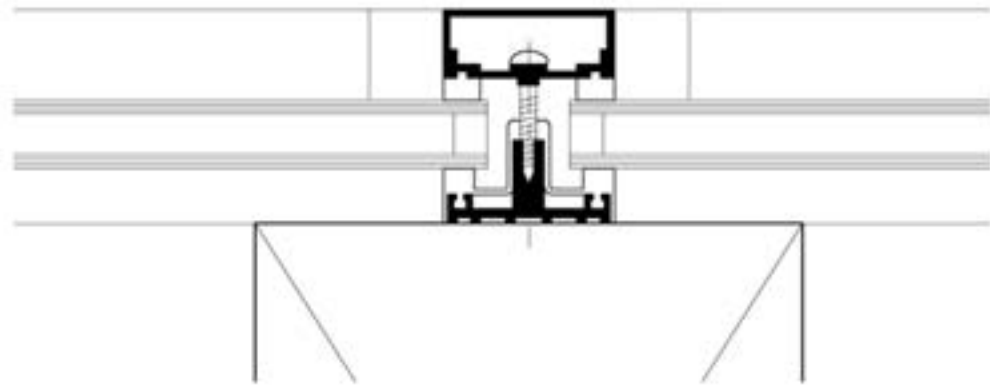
Author (2022). Glass Roof Detail - Greenhouse [Drawing].
